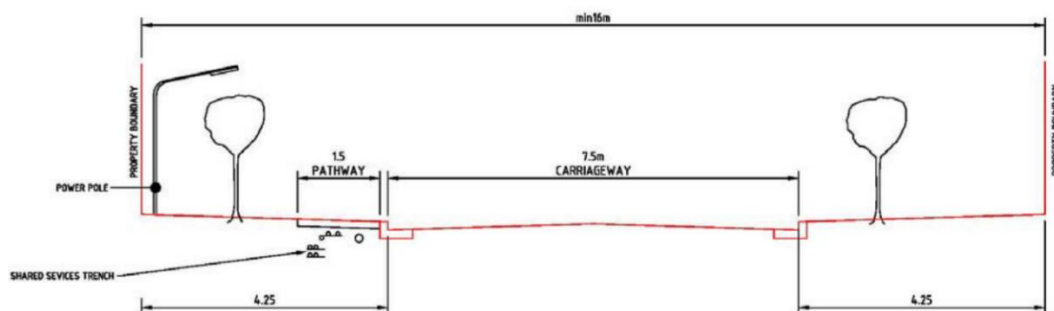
Typical Road Plans and Cross Sections - Local Streets
